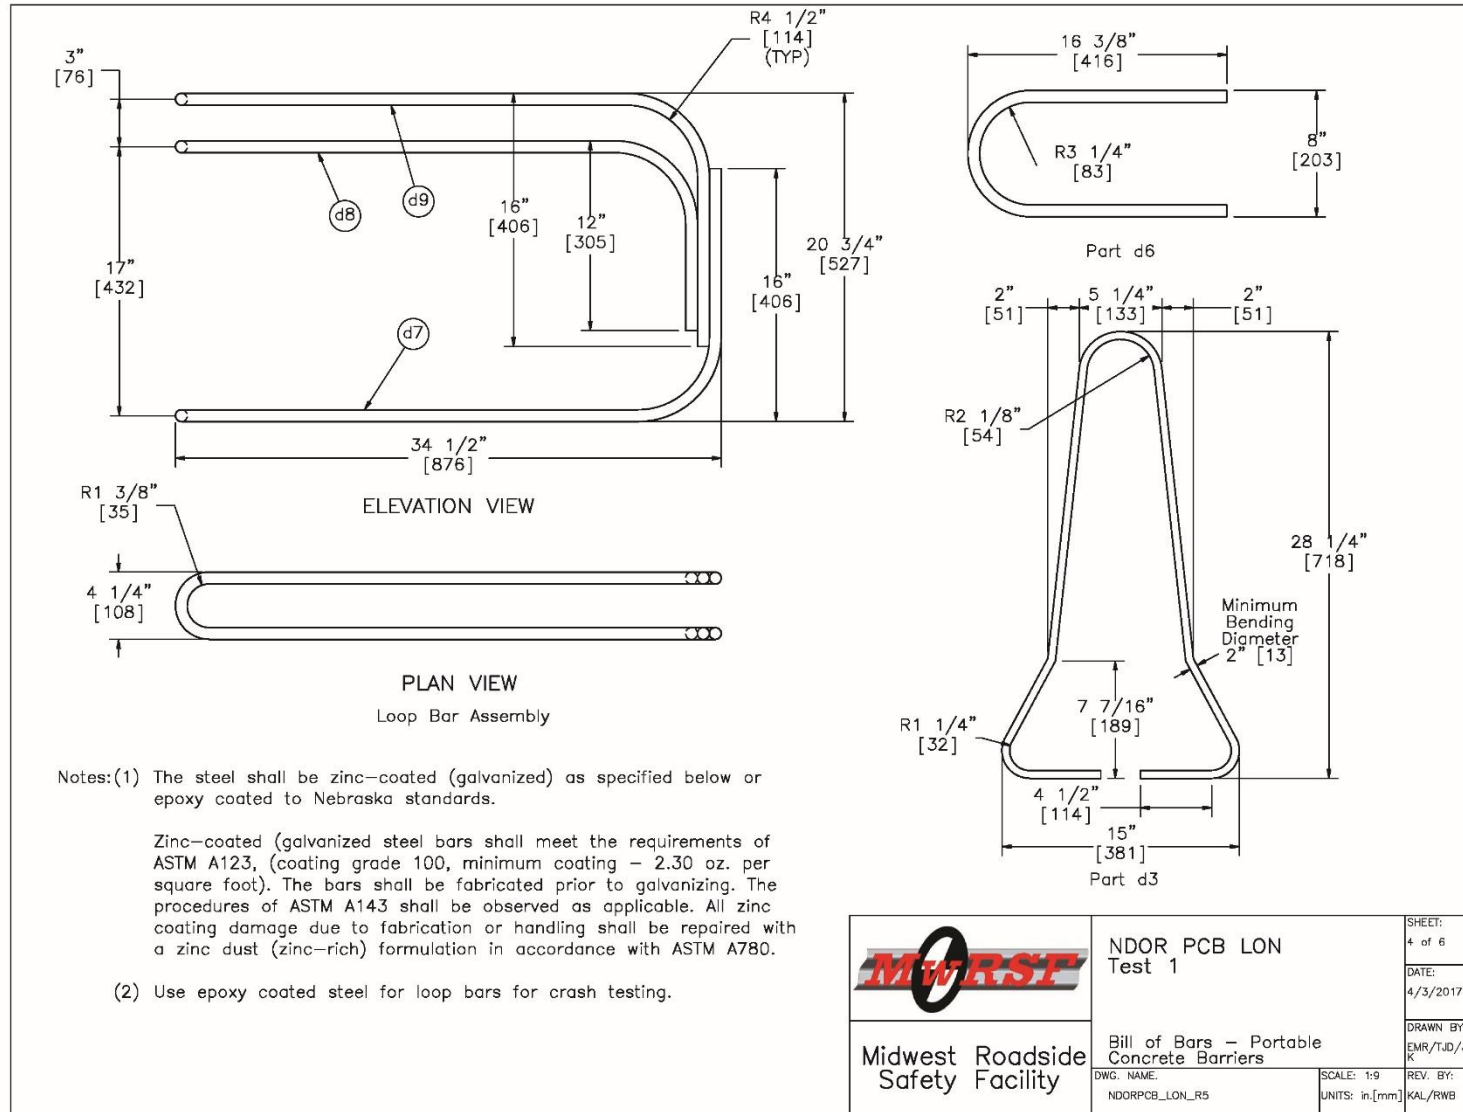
Bill of Bars – Portable Concrete Barriers, Test Nos. NELON-1 and NELON-2
